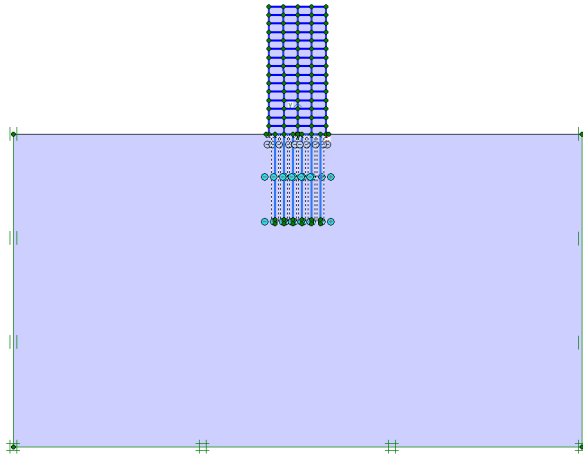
Piled Raft Foundation with Floating Piles FEM Model.
